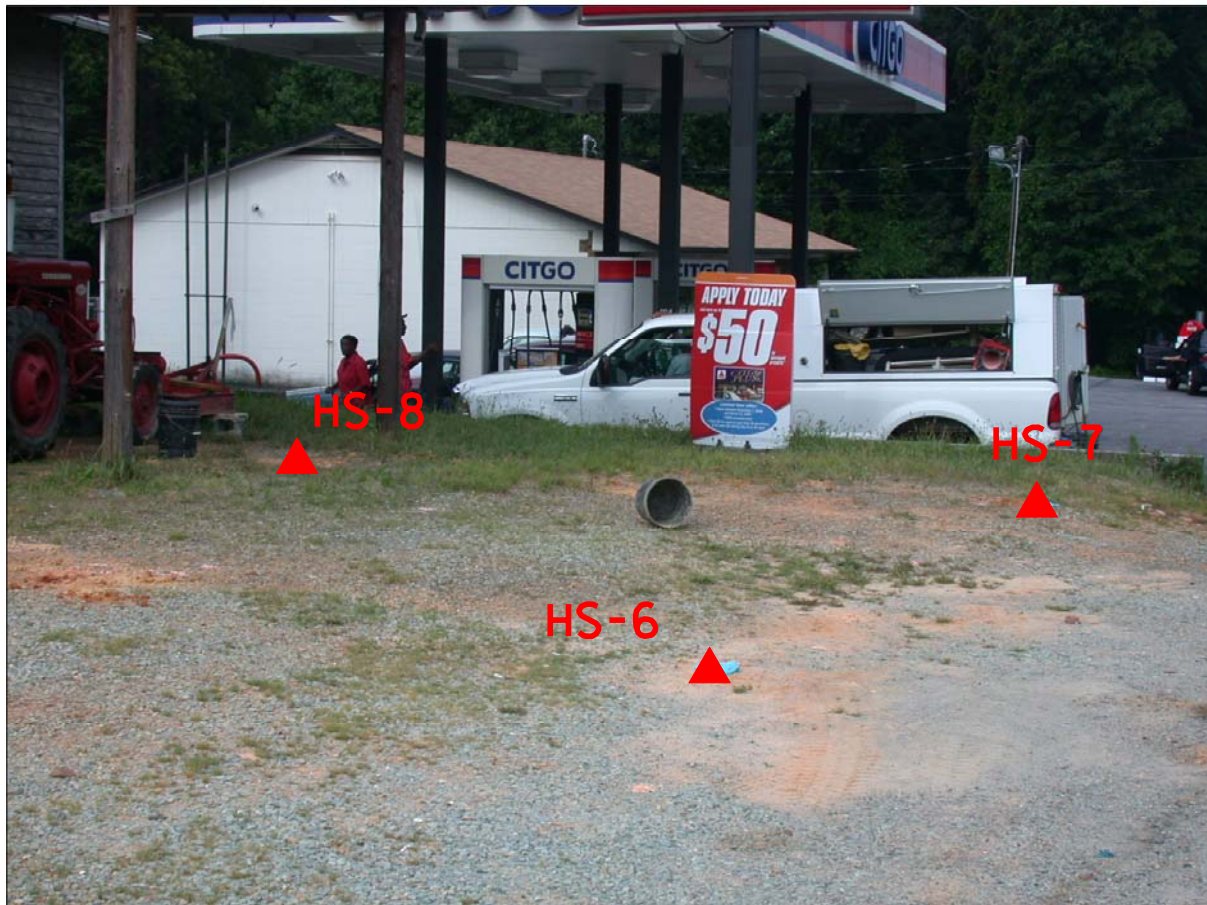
BORINGS AT HARRIS PROPERTY LOOKING SOUTHWEST FROM STREET
